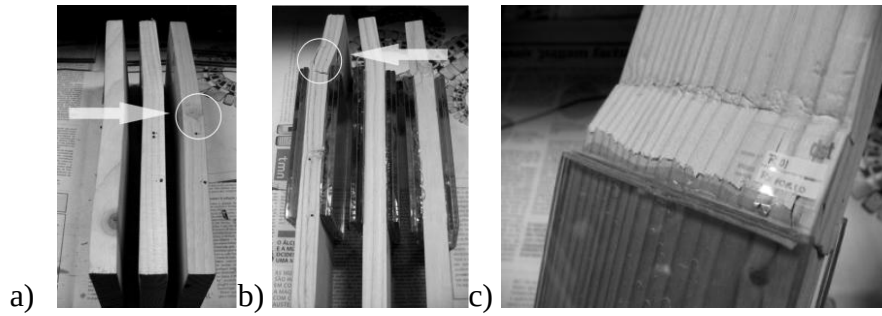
, b and c: Timber reinforcement with parallel glass plates [29]
